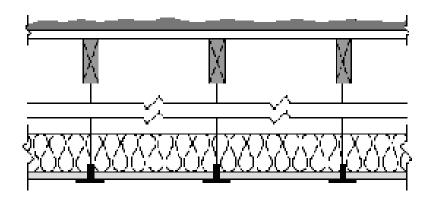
Insulated Ceiling with Removable Panels
